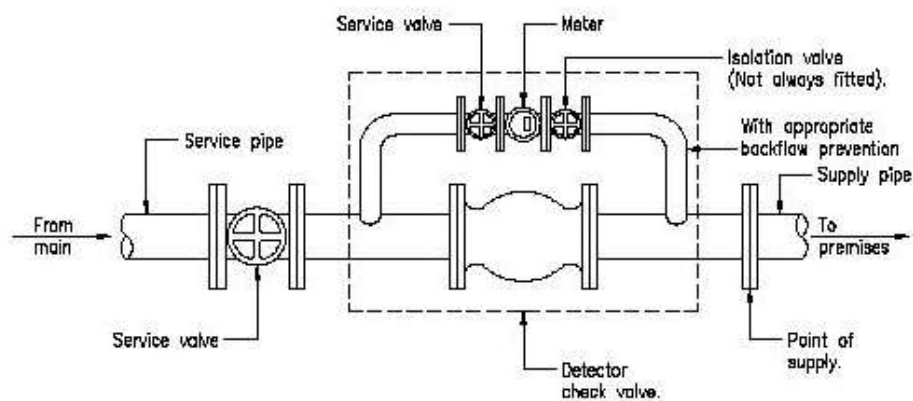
continued. Examples of Fitting Details showing Point of Supply
